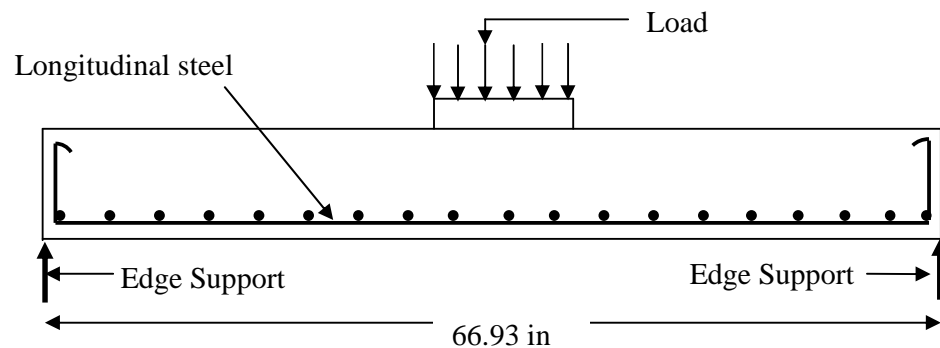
Setup of slab section with straight reinforcement and 11.81 inch or 19.7 inch thick; (Graf 1938)
